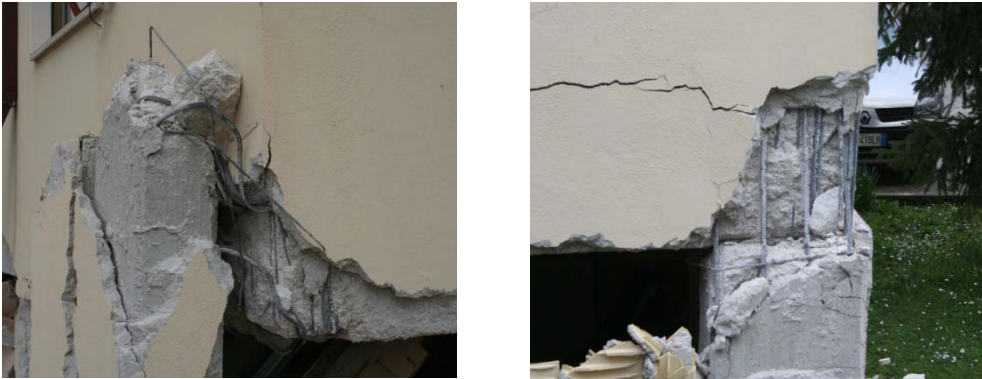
Damage highlights not properly treated casting surface (a, b) and absence of stirrups in the joint area (b), (Verderame et al., 2009).
